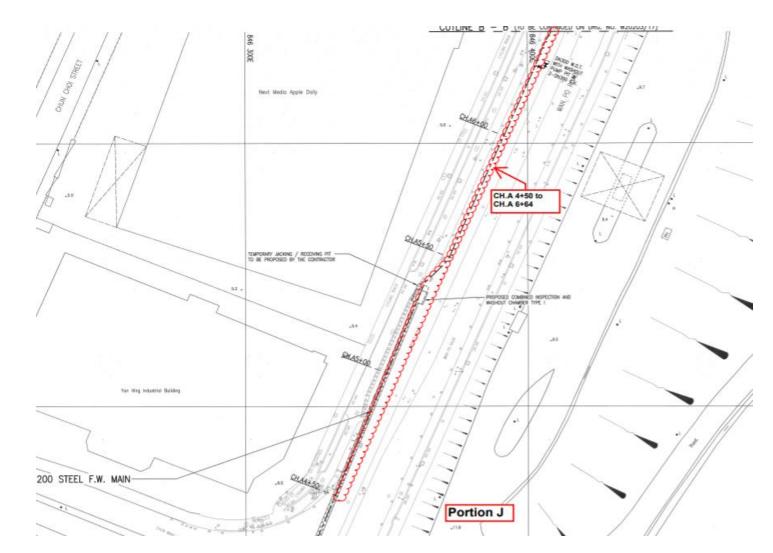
Location Plan for Portion J - CH.A 4+50 to CH.A 6+64
